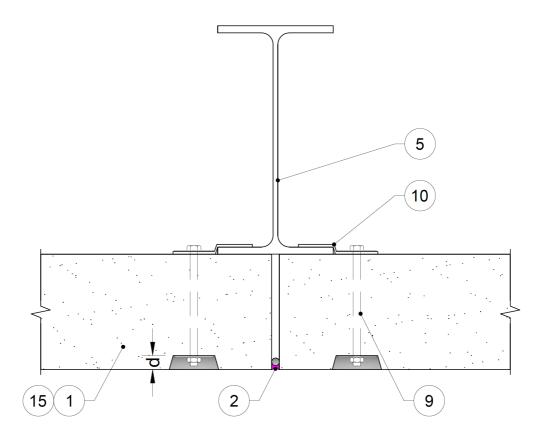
Plan Section at Vertical Steel Column – Z Clips and Recessed Bolts
